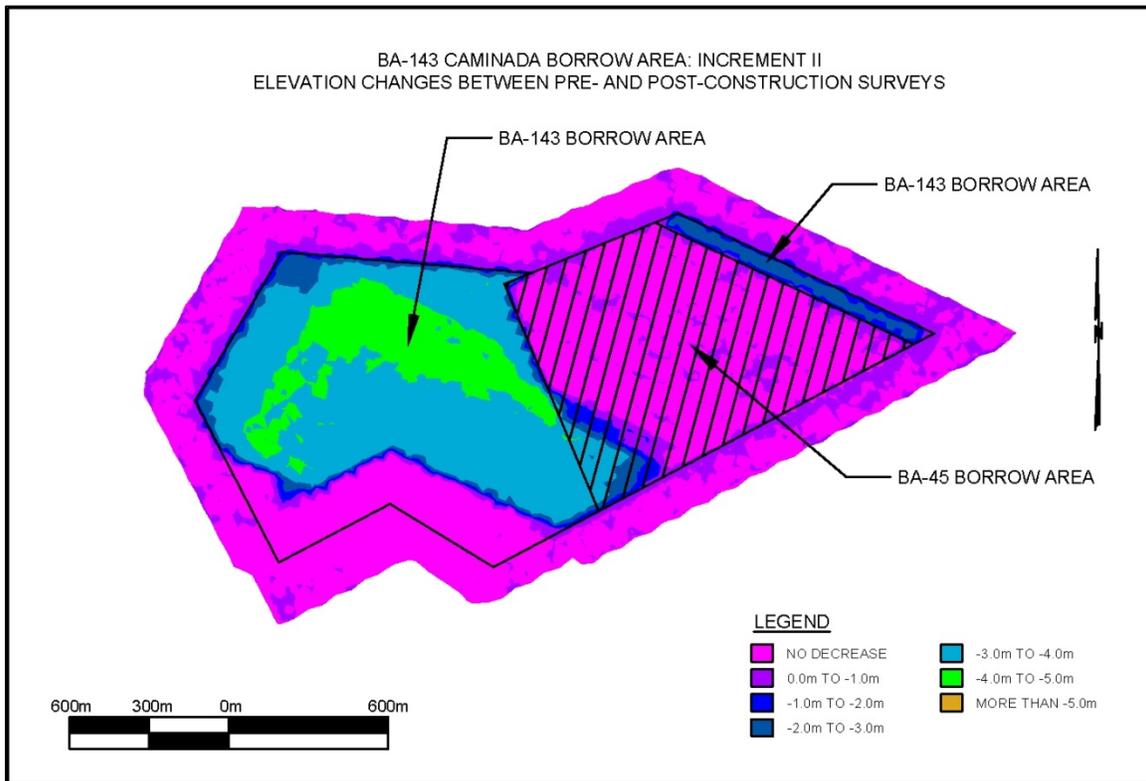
BA-143 Borrow Area Elevation Changes Between Pre- and Post-Construction Surveys
